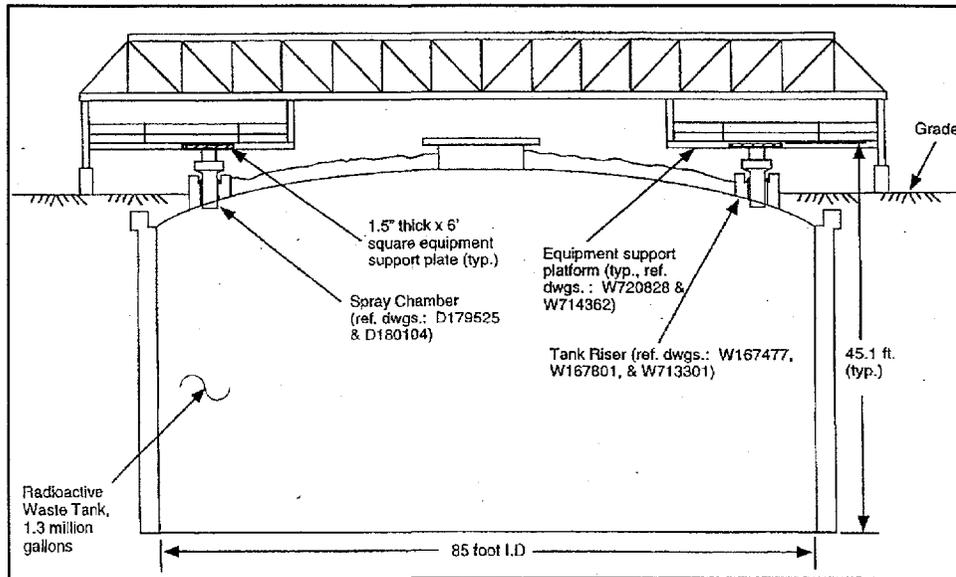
Savannah River Site Tank 19 Riser and Bridge Configuration
